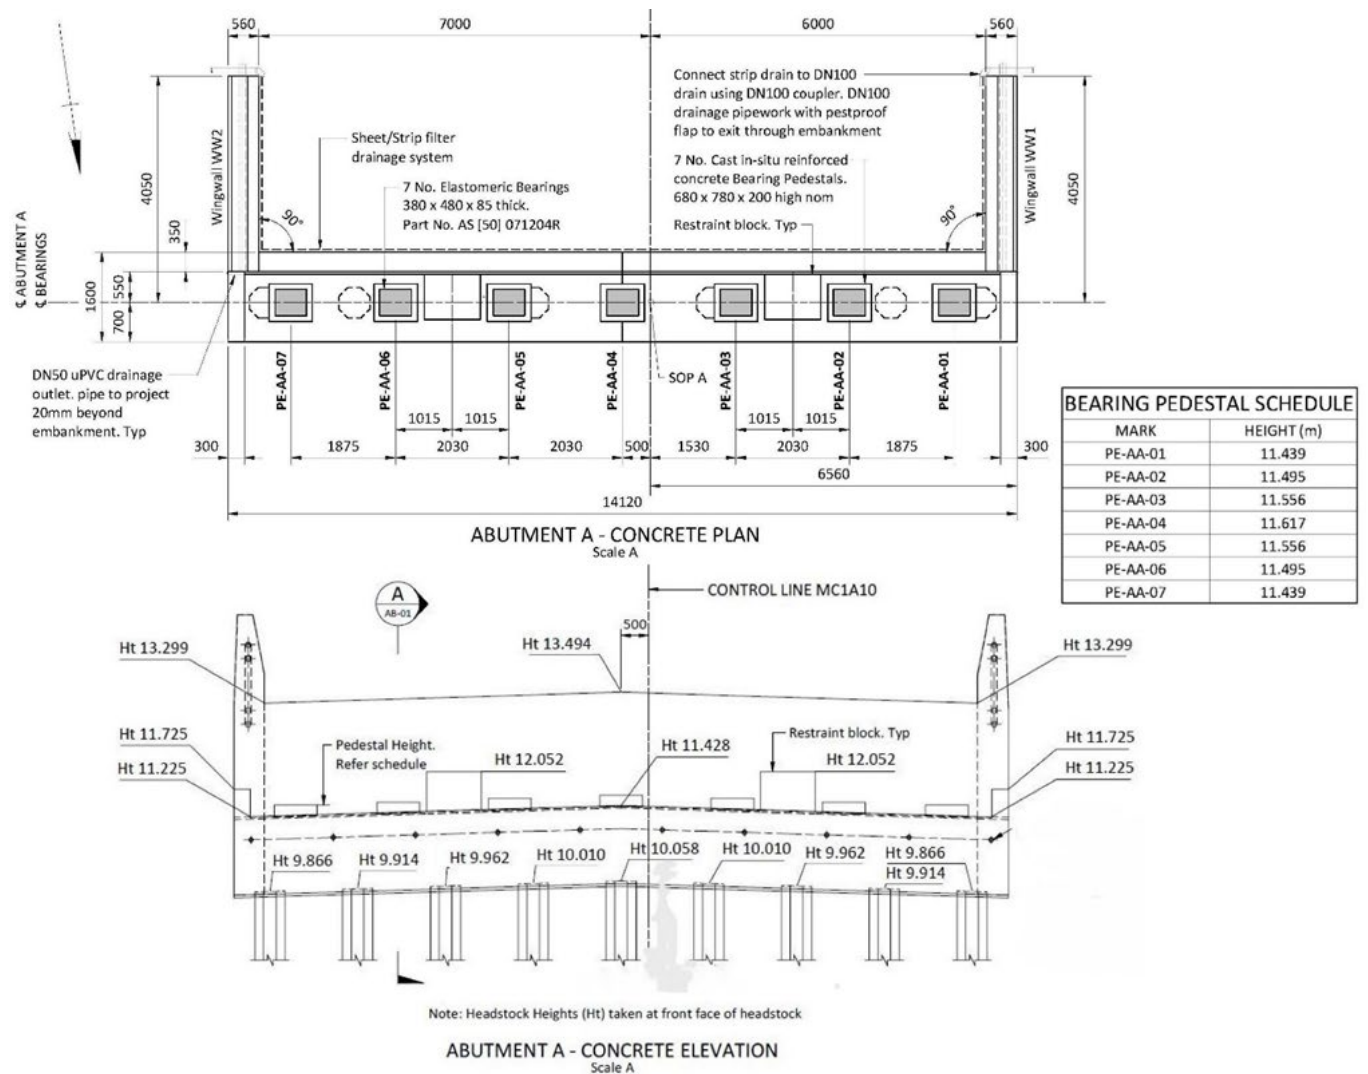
(b) – Example of girder bridge abutment in section showing bearing pedestal
